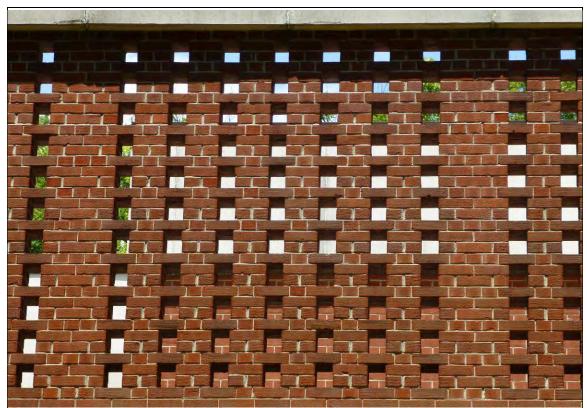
Building 647, close-up of the perforated brick detail on the right side of the south elevation (ERDC-CERL, 2014).
